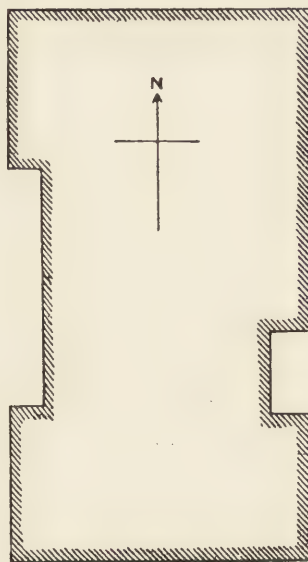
PLAN OF THE PIER AT THE NORTH-WEST-ANGLE OF THE SOUTH-WEST HALL.
